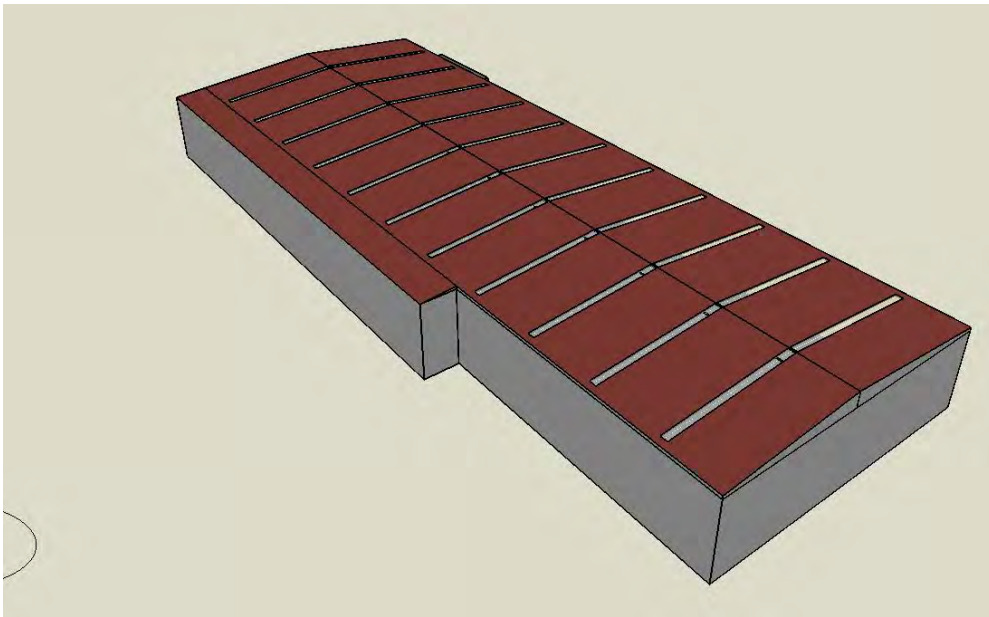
Design Builder model showing the proposed skylights on the industrial building to achieve daylight access requirements
